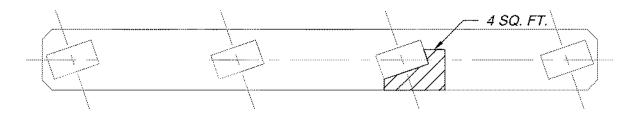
Location of Proposed Concrete Repairs - Pier 1 Plan View MP 182.1
